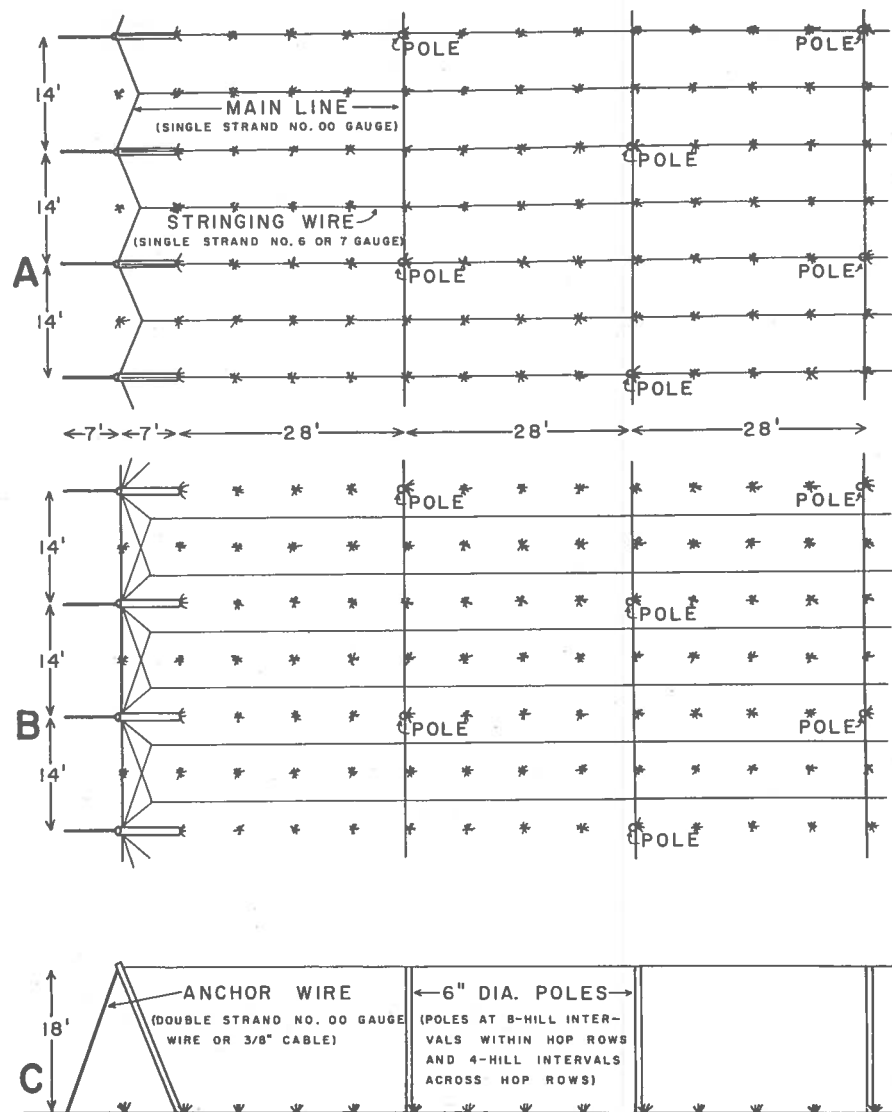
Diagram showing common trellis designs on 7 foot by 7 foot spacing: (A), Stringing wires placed over rows; (B), stringing wires placed over centers; (C), side elevation showing system of anchoring used on edges of yard.
